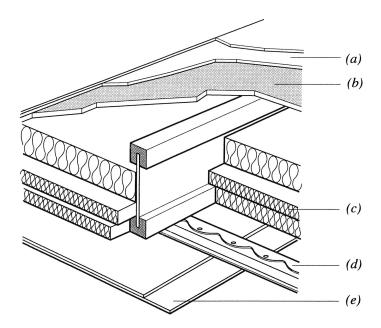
Floor system with light-weight I-joists as primary load-bearing elements.
